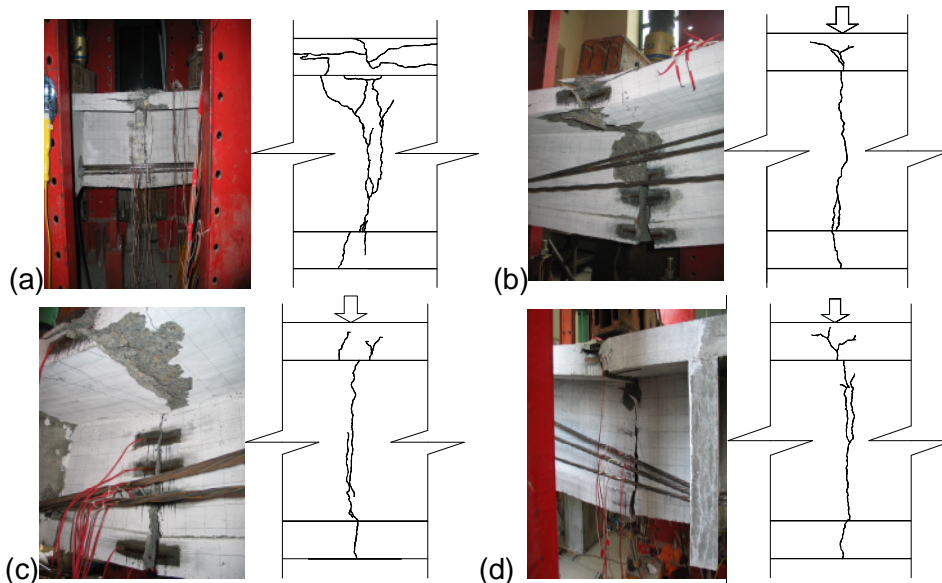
Actual failure modes and cracking sketches of epoxied joints: (a) SE-1; (b) SE-2; (c) SE-3; (d) SE-4
